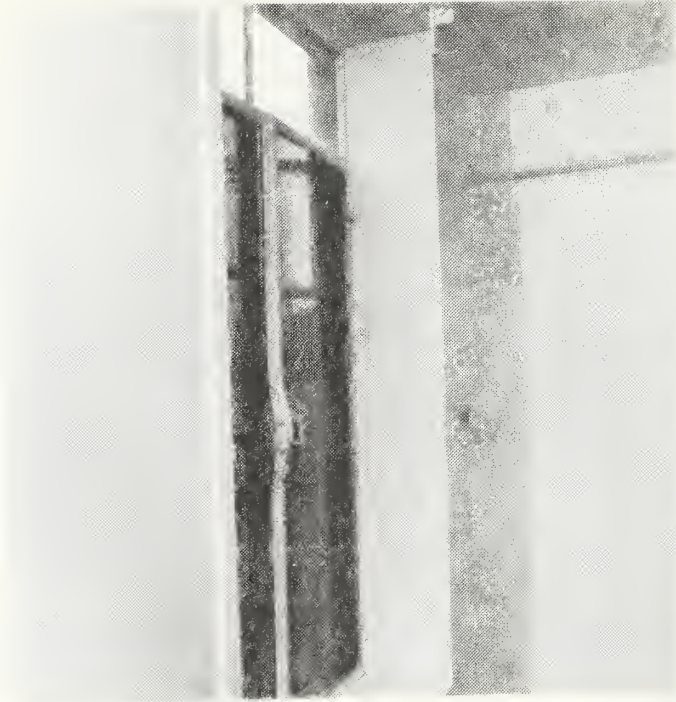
Re-finished plaster walls, metal window and concrete ceiling in kitchen.
